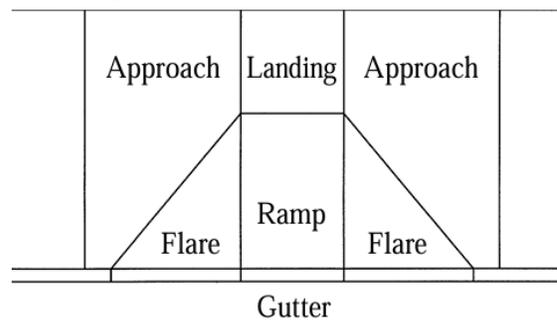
| Illustration highlighting curb ramp components and accessible dimensions. (Source: U.S. Access Board – PROWAG)
